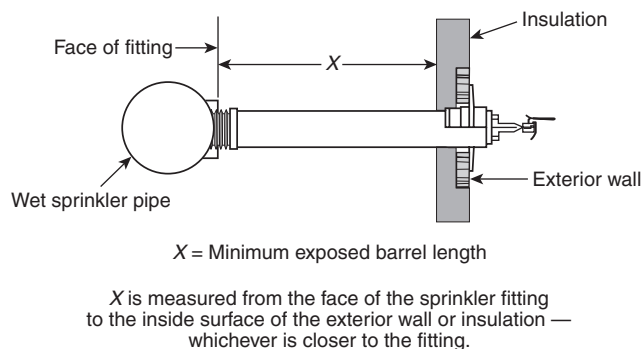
(a) Dry Sidewall Sprinkler Through Wall.
